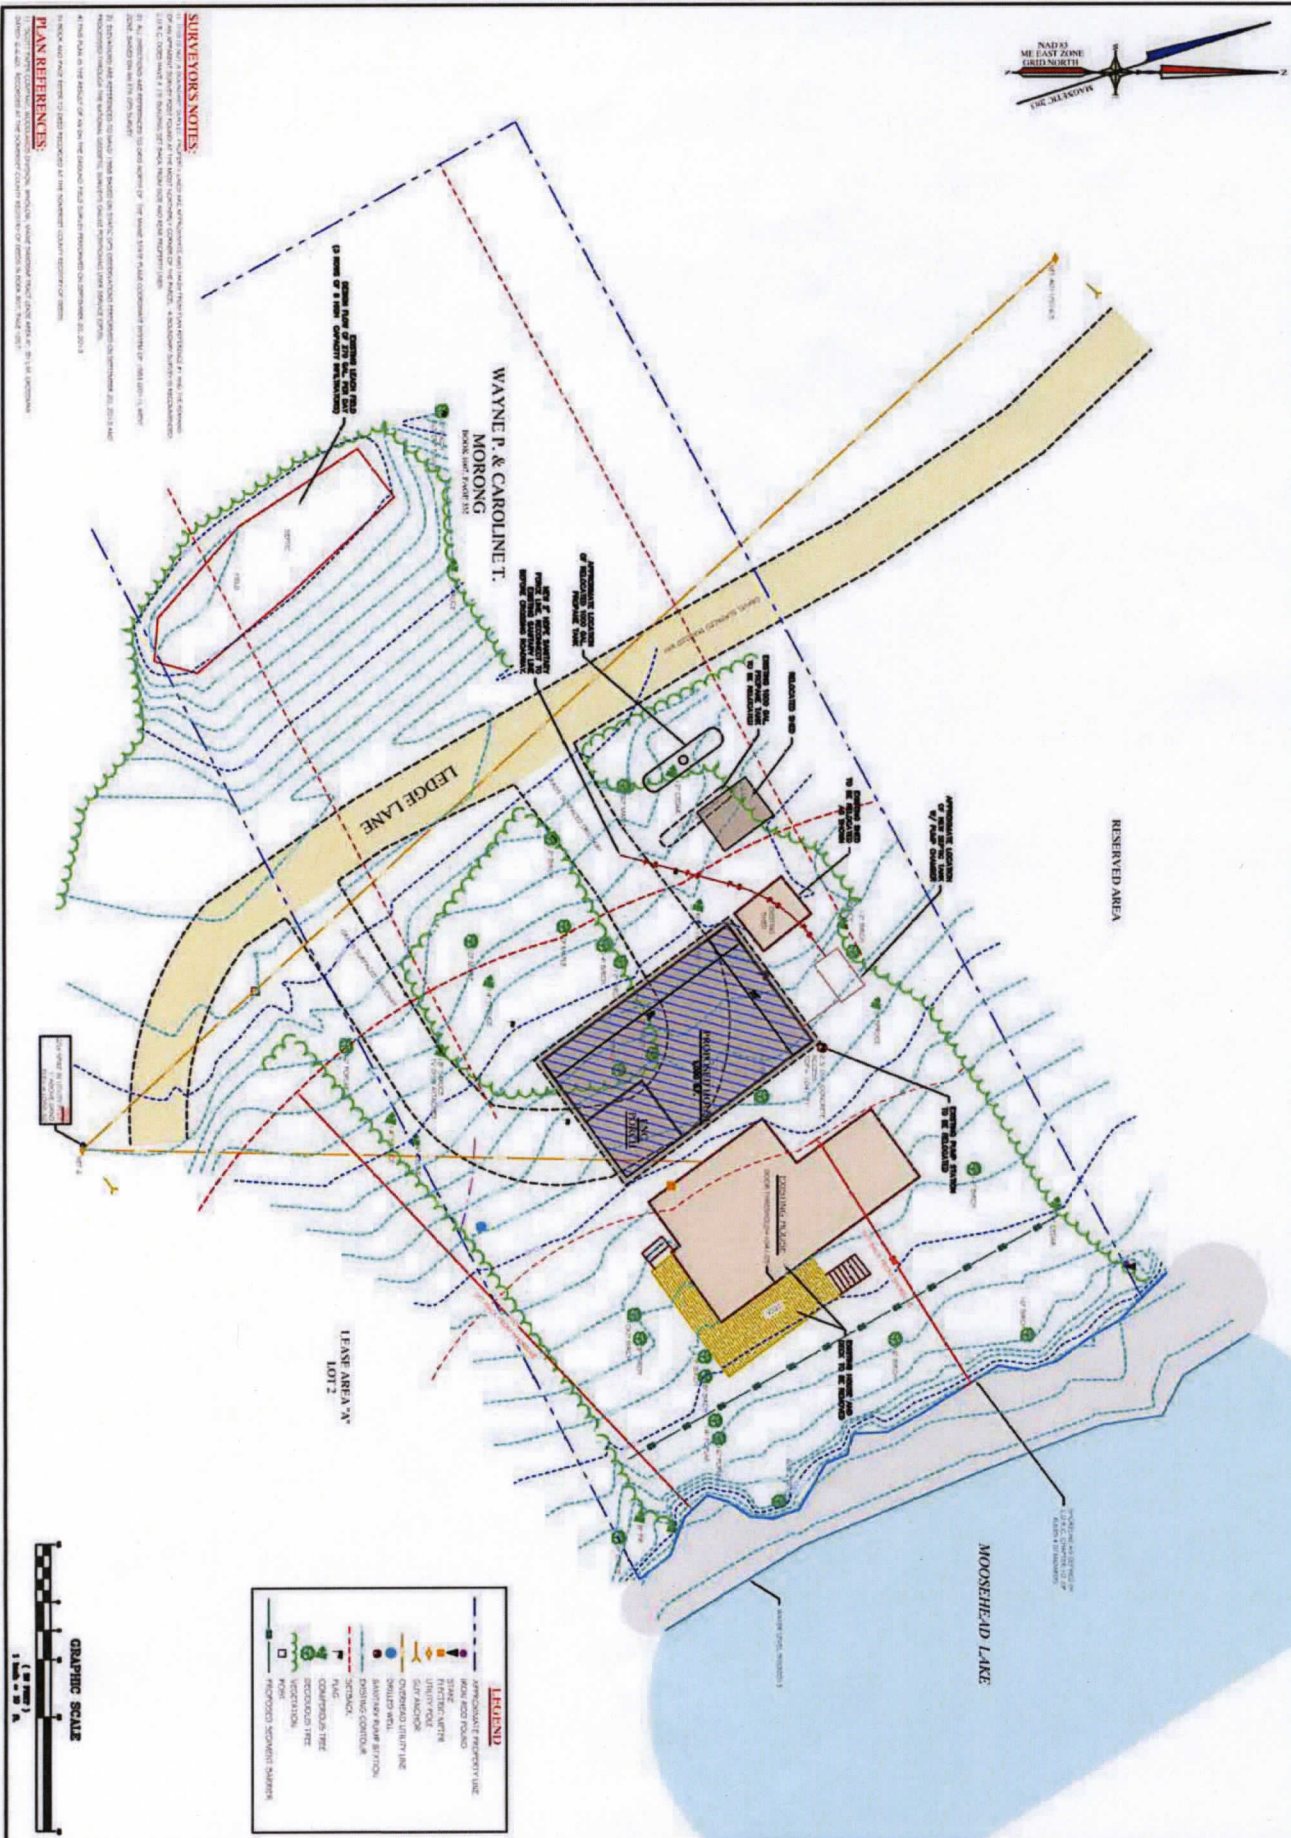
PHOTO ATTACHMENT TO BUILDING PERMIT APPLICATION
